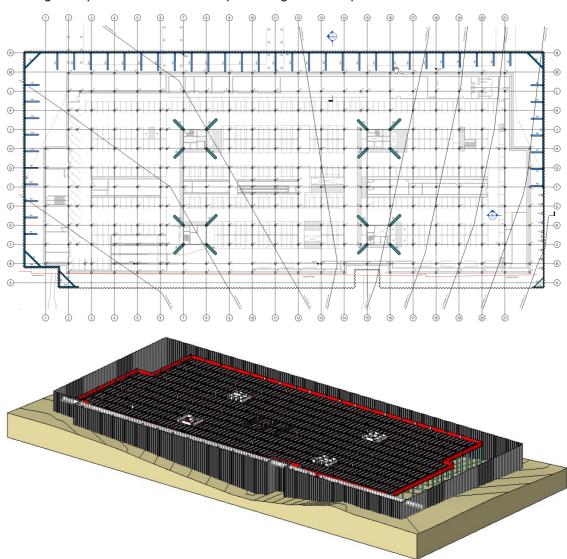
Plan & 3D view showing extent of sheet pile wall
